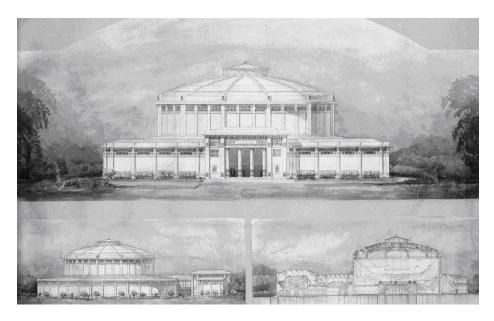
Vitale, "concours de construction générale" 1922: a panorama. Facades and section (BENSBA, CG 360)
